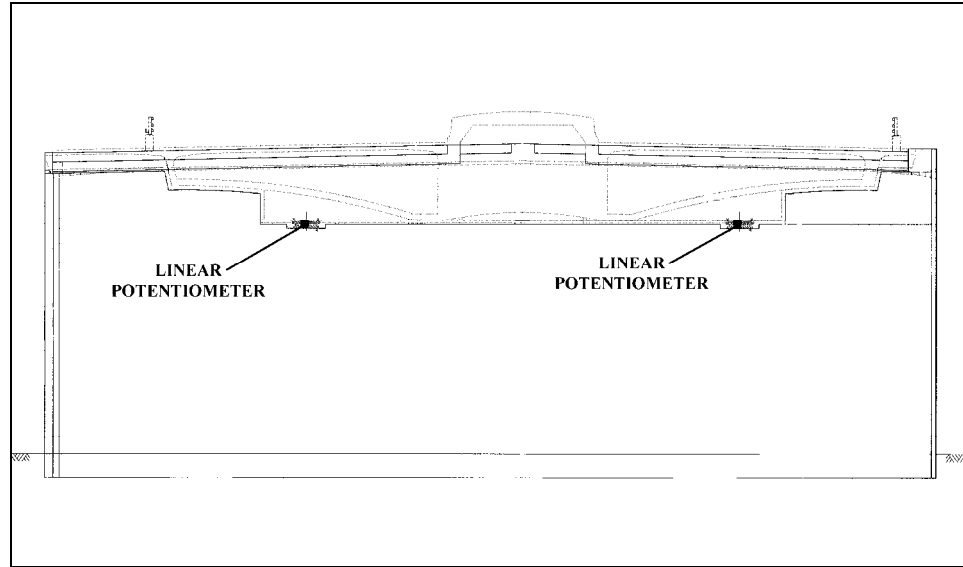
Abutment Bearing Linear Potentiometer Locations (North and South Abutment) (Modified IRIB Specifications and Construction Plans)
